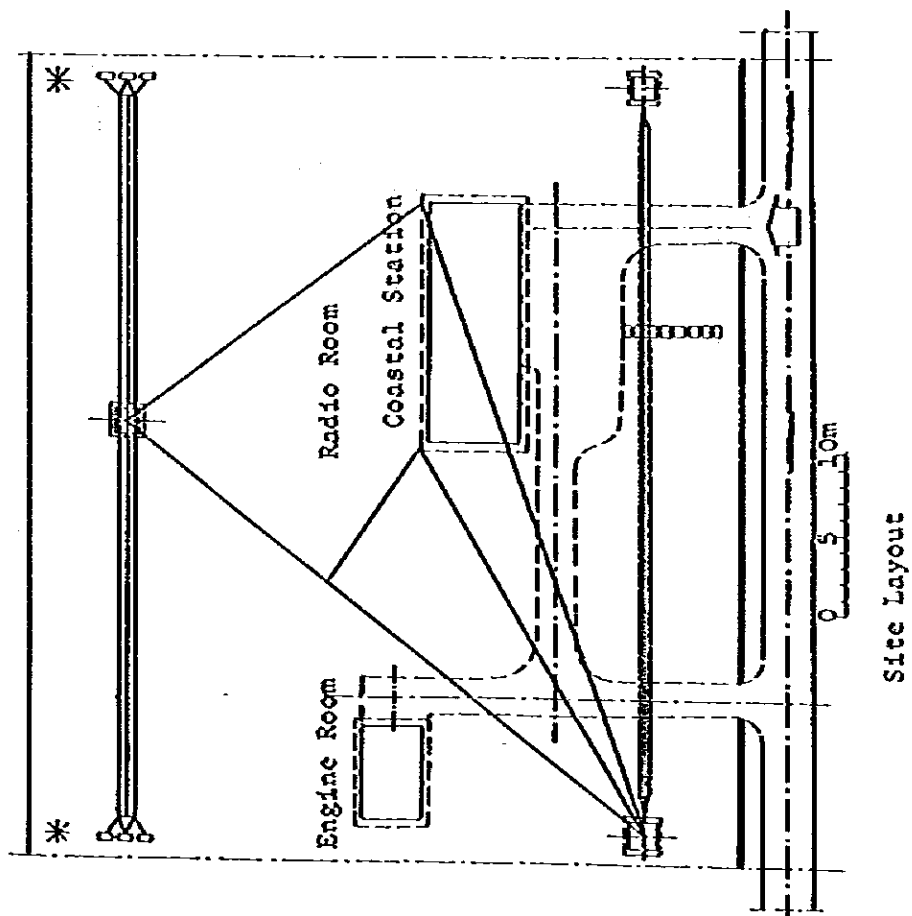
(2) Site and Floor Layout (Cilacap)
